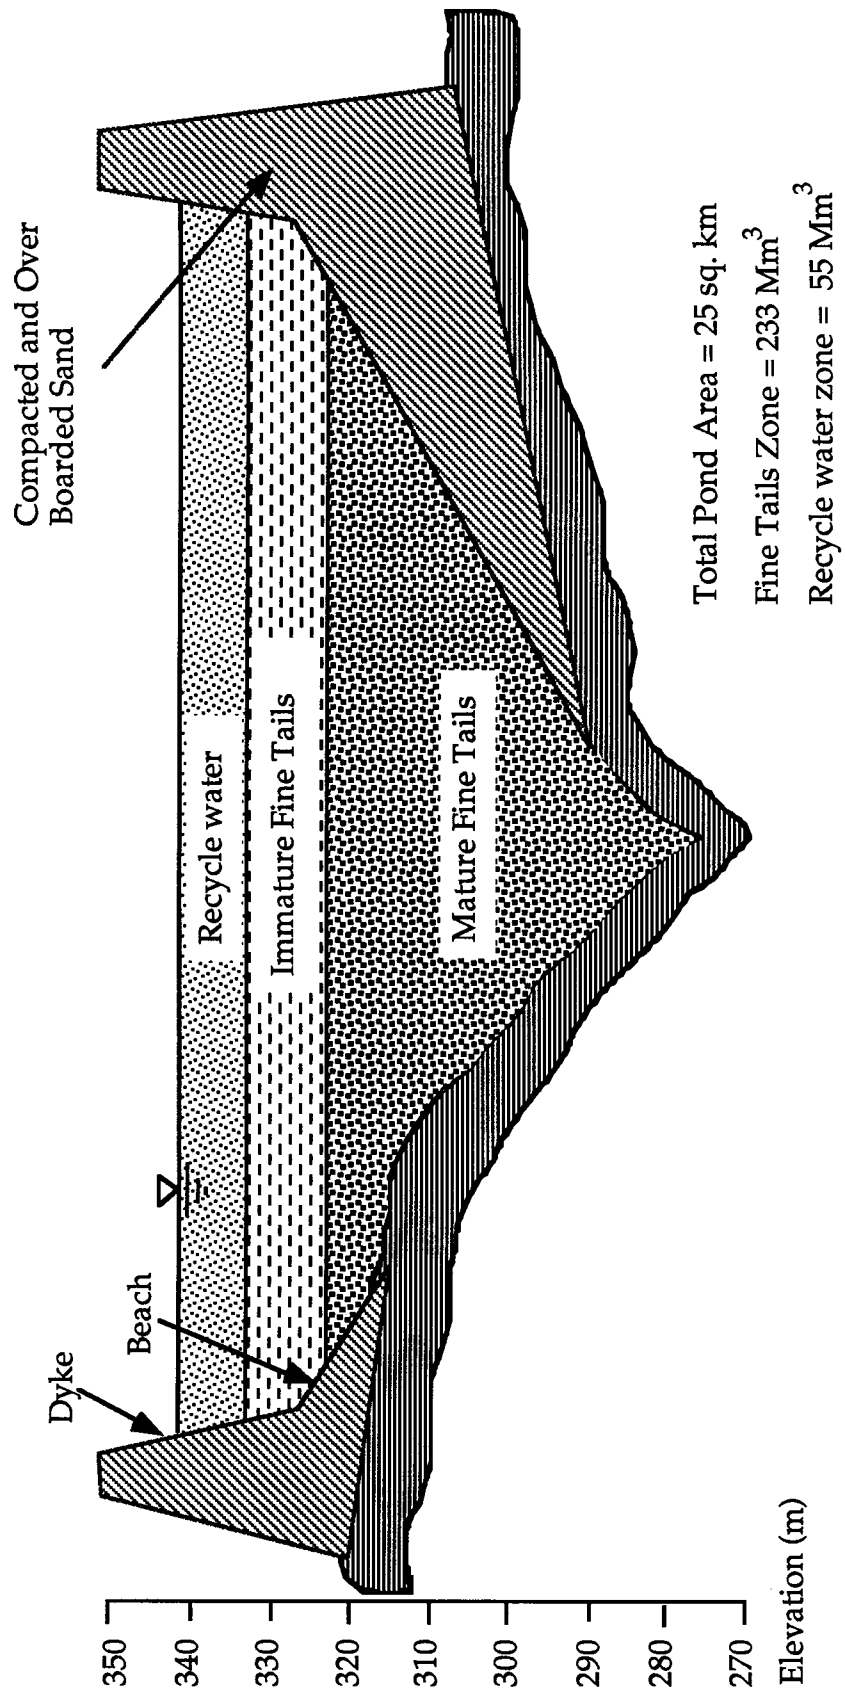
Cross Section of the Syncrude Tailings Pond
